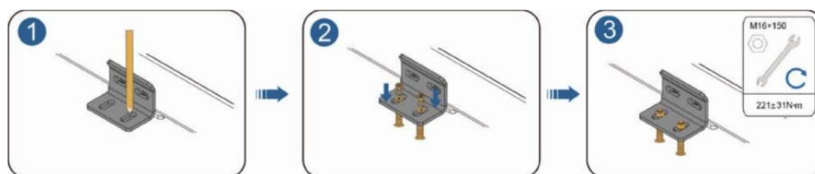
Schematic diagram of container welding and fixing
